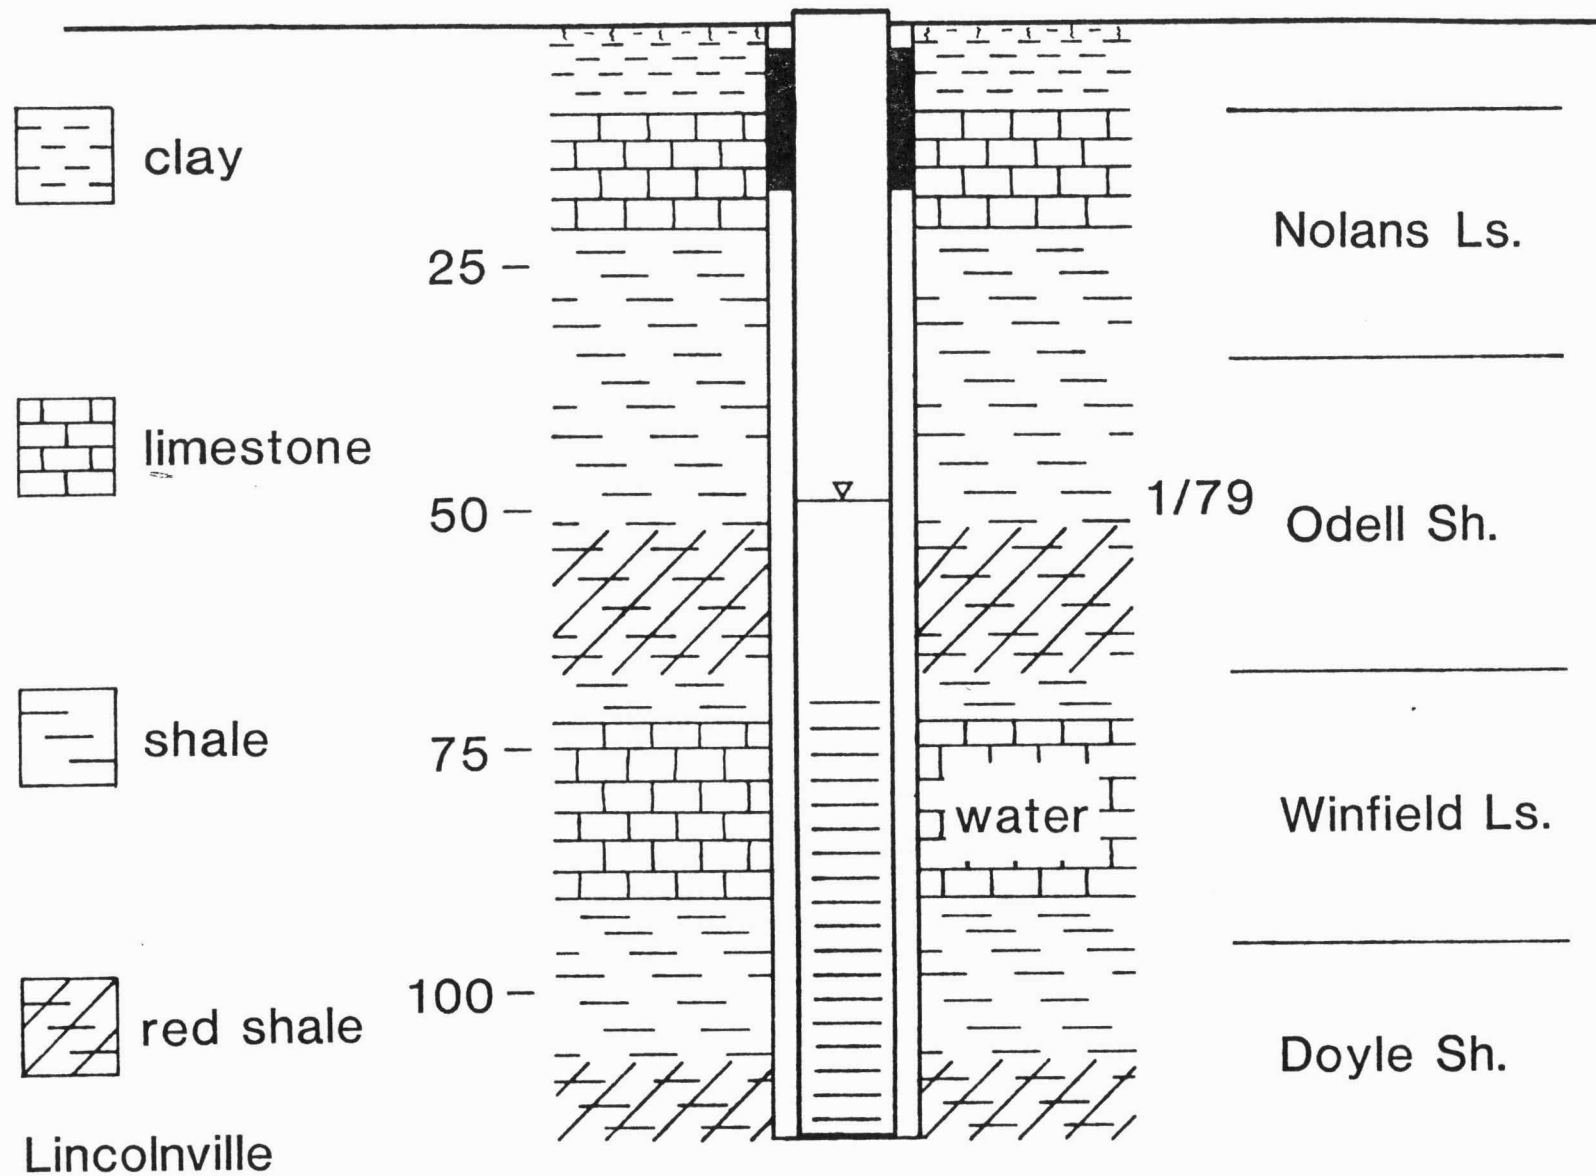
Cross-section showing well construction details for well #10 (vertical scale in feet).
